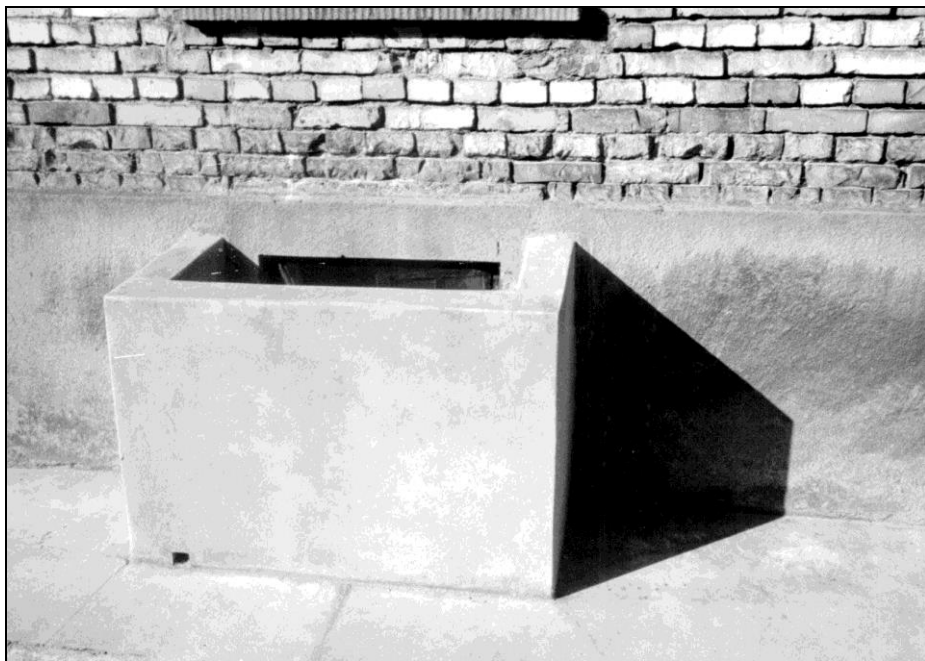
Block 11, outside, wall facing NNE, one of the concrete screens around the window well of a bunker cell.
